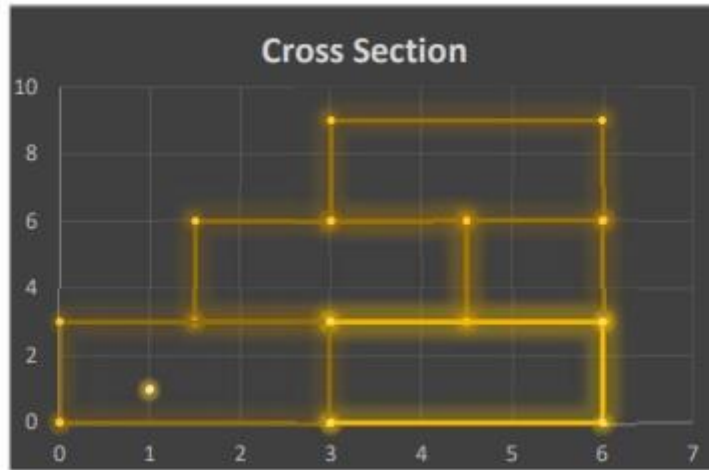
X-section view of Gabion Retaining wall from Excel VBA
